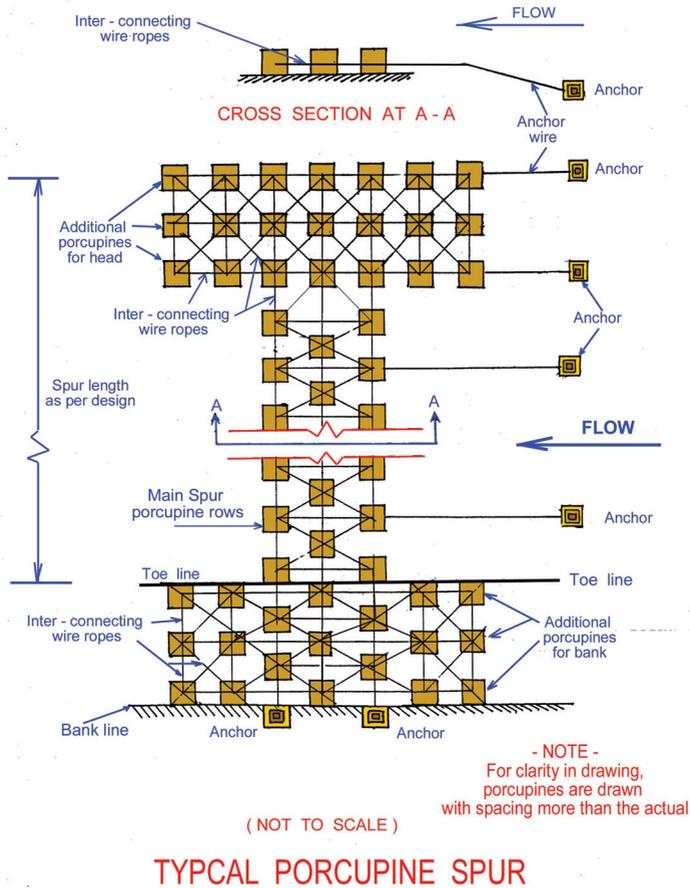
Sketch of typical layout of Porcupine Spur
